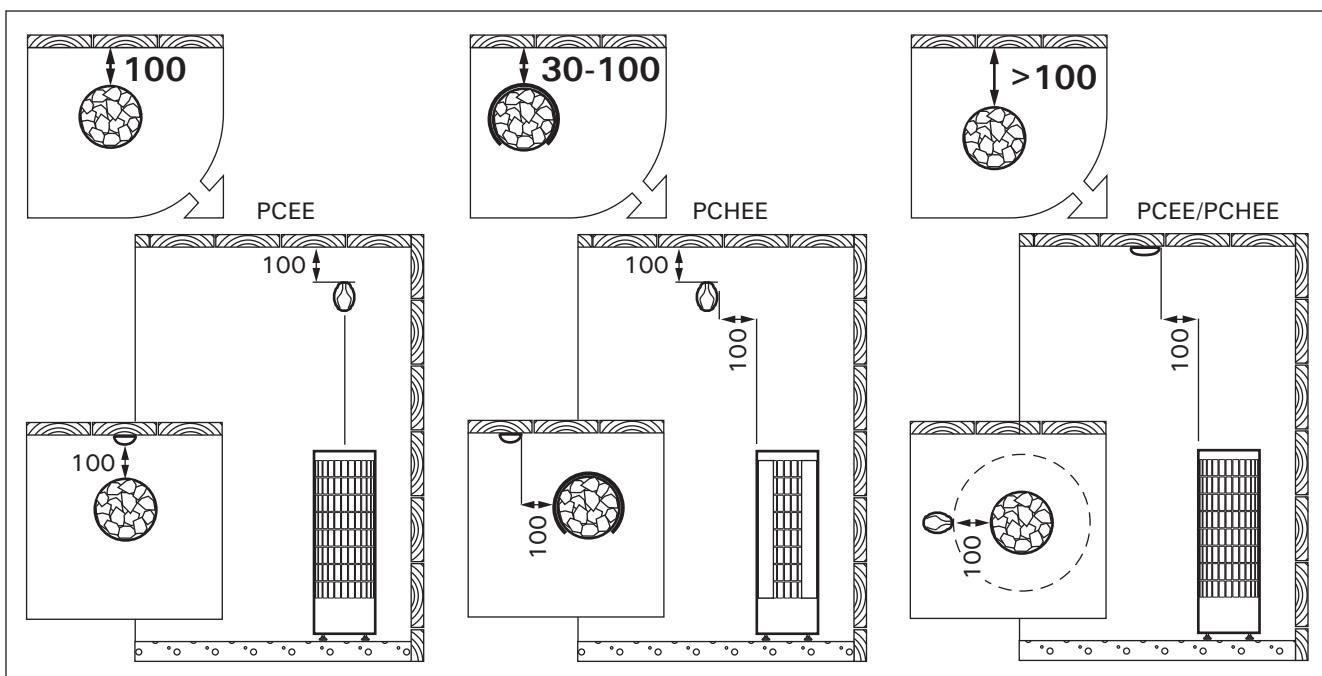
Installing the sensor (all dimensions in millimeters)
